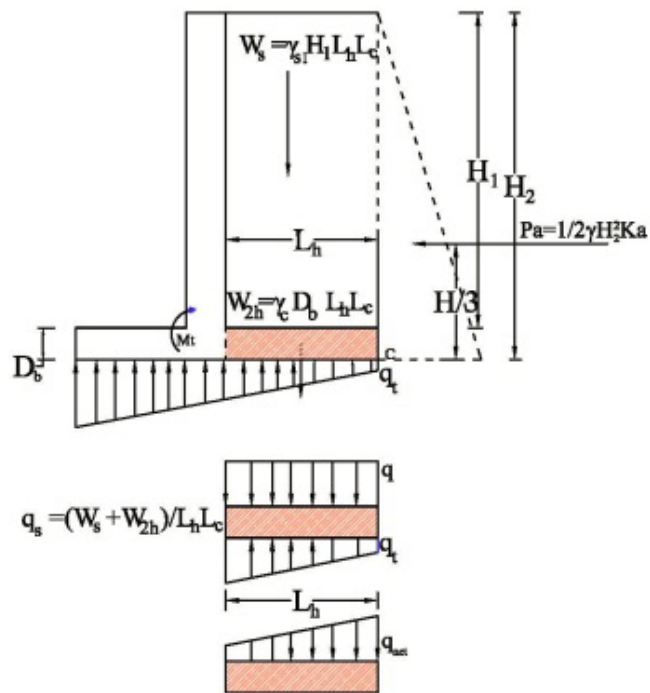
Forces on the heel slab of a counterfort wall as proposed by Huntington [6]
